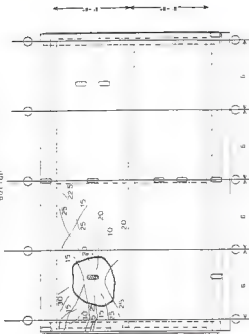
Bottom Cracking Pattern (First Bridge - Test No 8)
